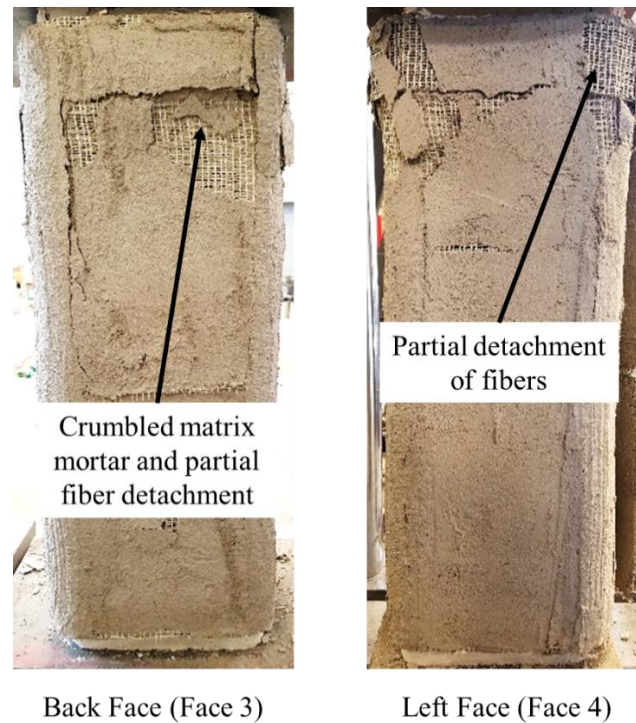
Specimen C-12-38-1-4 After Testing: Back and Left Faces
